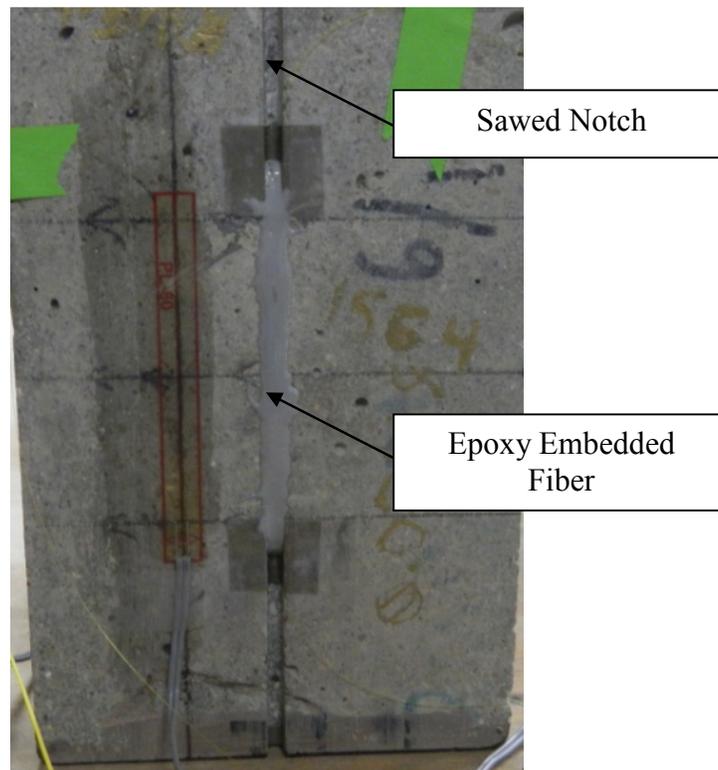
Bond Resulting From Notch-Embedded Epoxy Procedure For Concrete Fiber Installation
